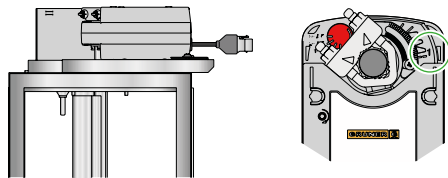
For damper position "Normally open" the damper should be open during installation of the spring return actuator. The spindle clamp then sits as shown above. NOTE! The spindle clamp needs to be moved to the rear of the motor, see figure 28-30.
